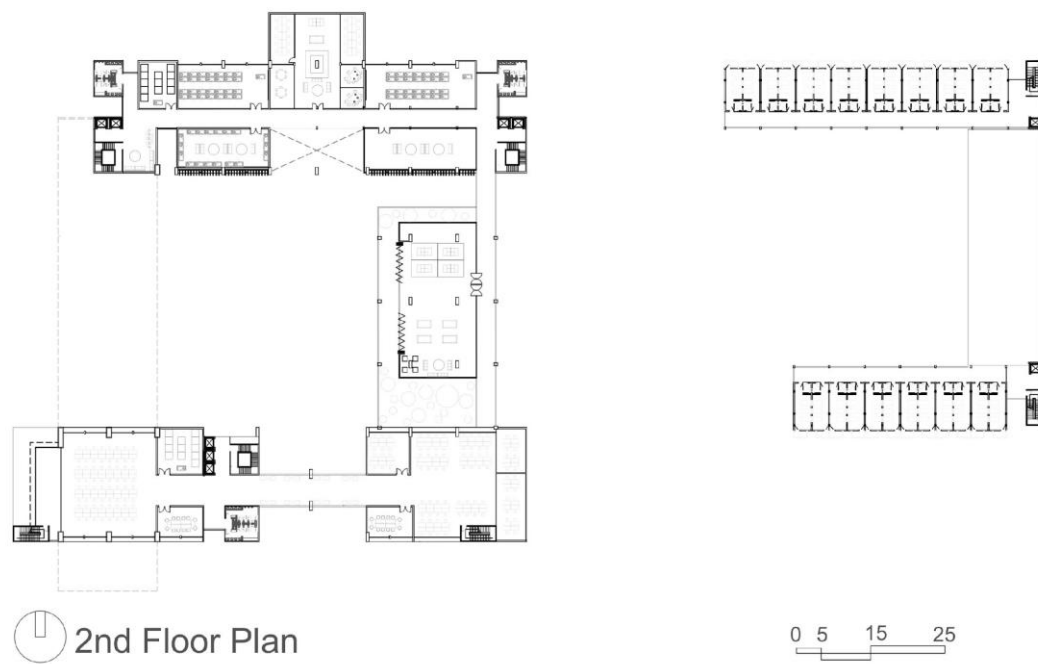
2nd floor plan,Source (Source:Author,2021)
